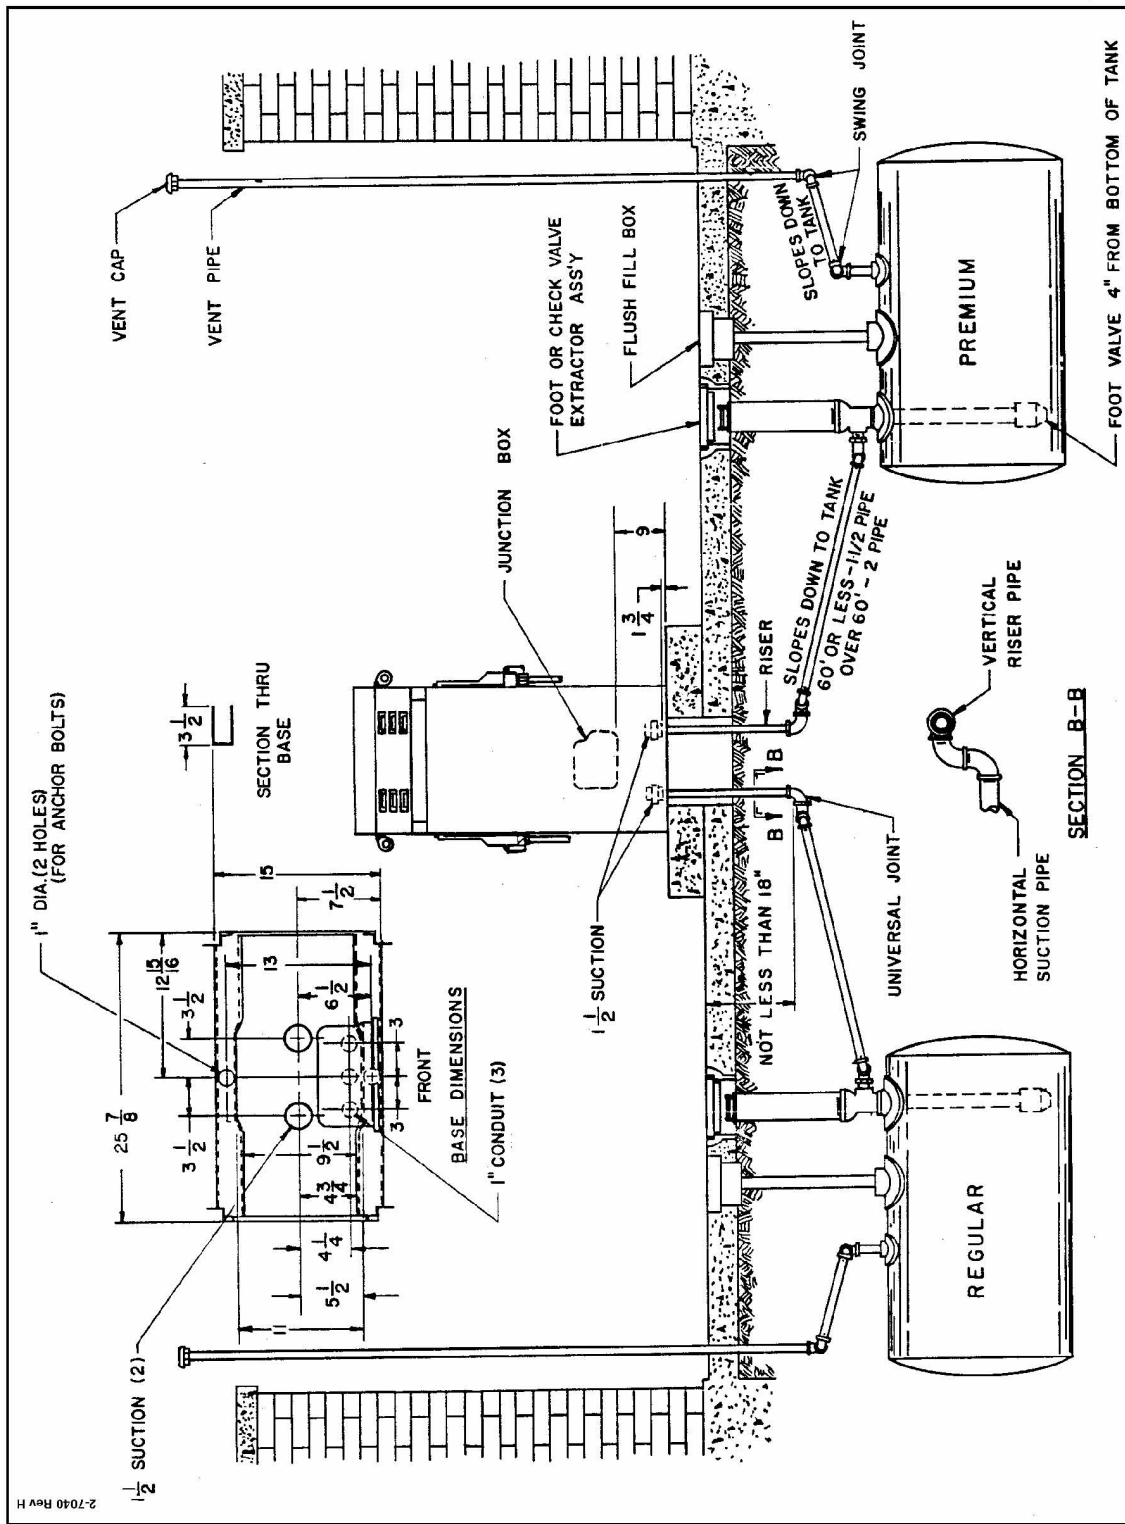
2-7040 INSTALLATION INSTRUCTION - 363, 373, 368, AND 378 SUCTION DISPENSERS.
